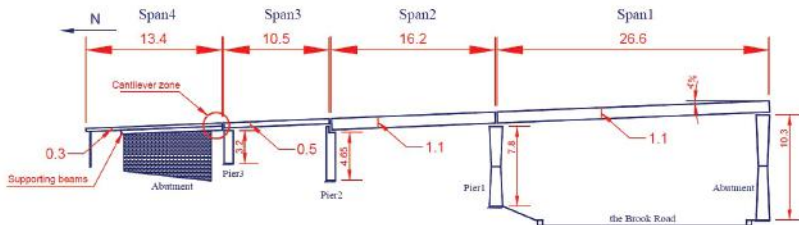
Model depiction of the Pentagon Road Bridge (Dimensions in metre)
